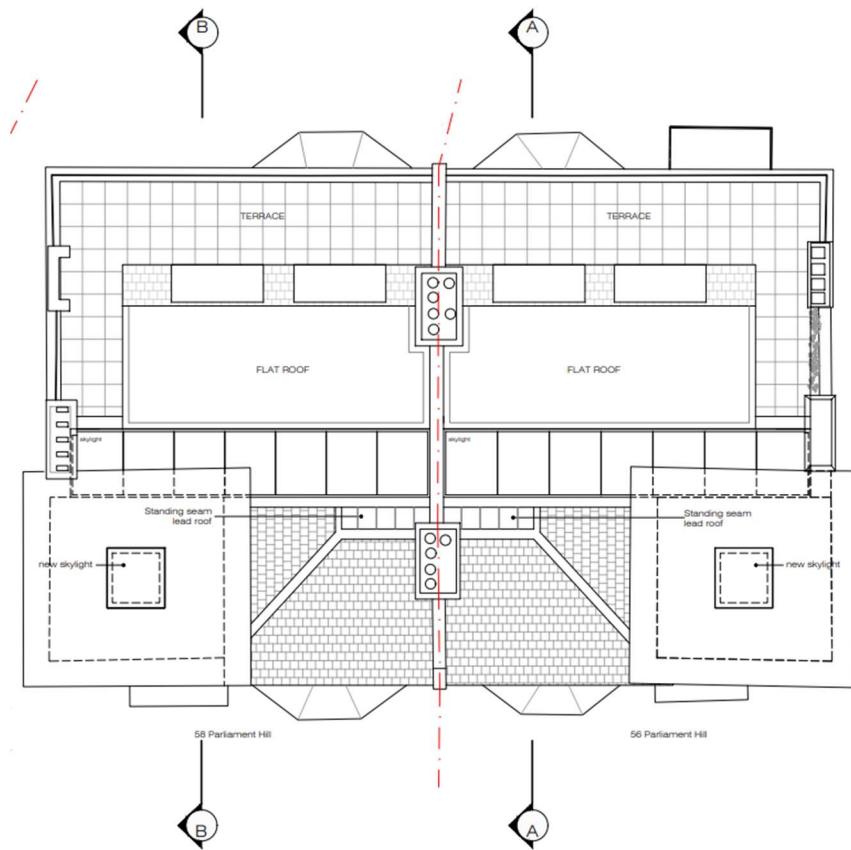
Proposed Roof Plan from current scheme (2025/3056/P)
